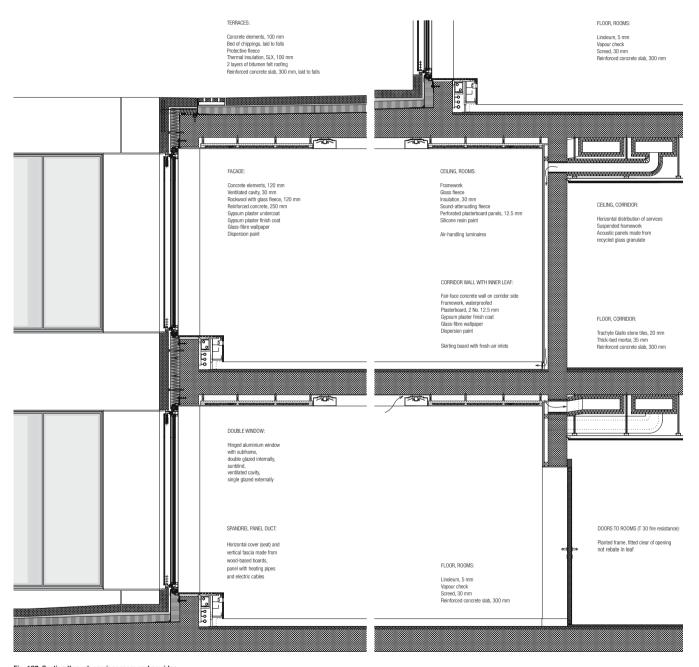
Section through seminar room and corridor Services are routed in ducts along the spandrel panels and above the suspended ceiling over the corridor.
